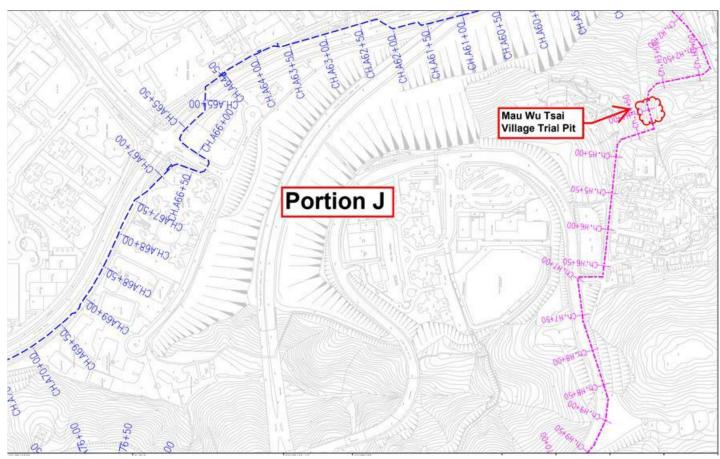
Location Plan for Portion J - Mau Wu Tsai 2 (Po Lam South Road 2)
